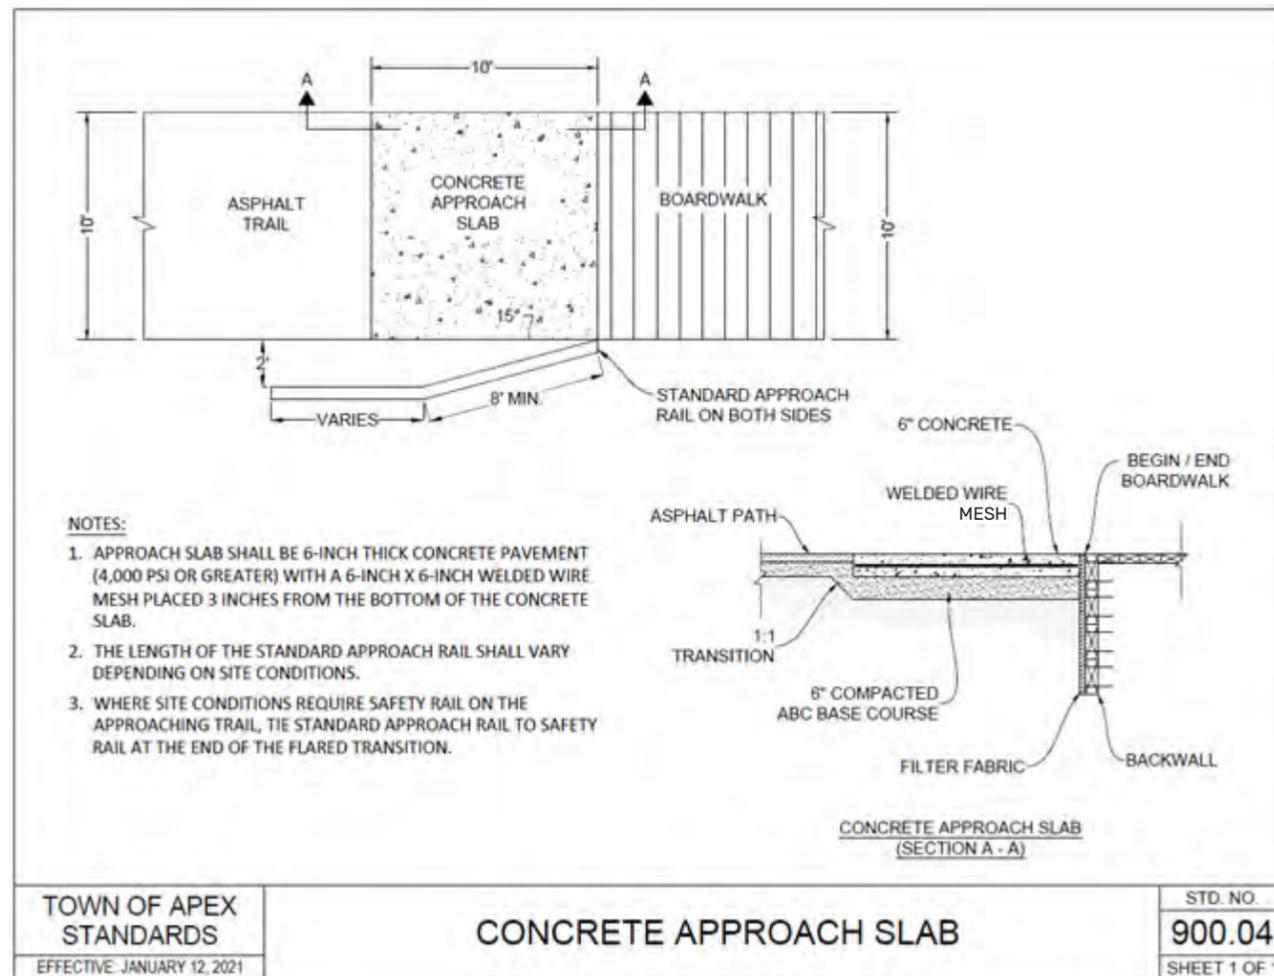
Existing Design Standard for Concrete Approach Slabs / Town of Apex
